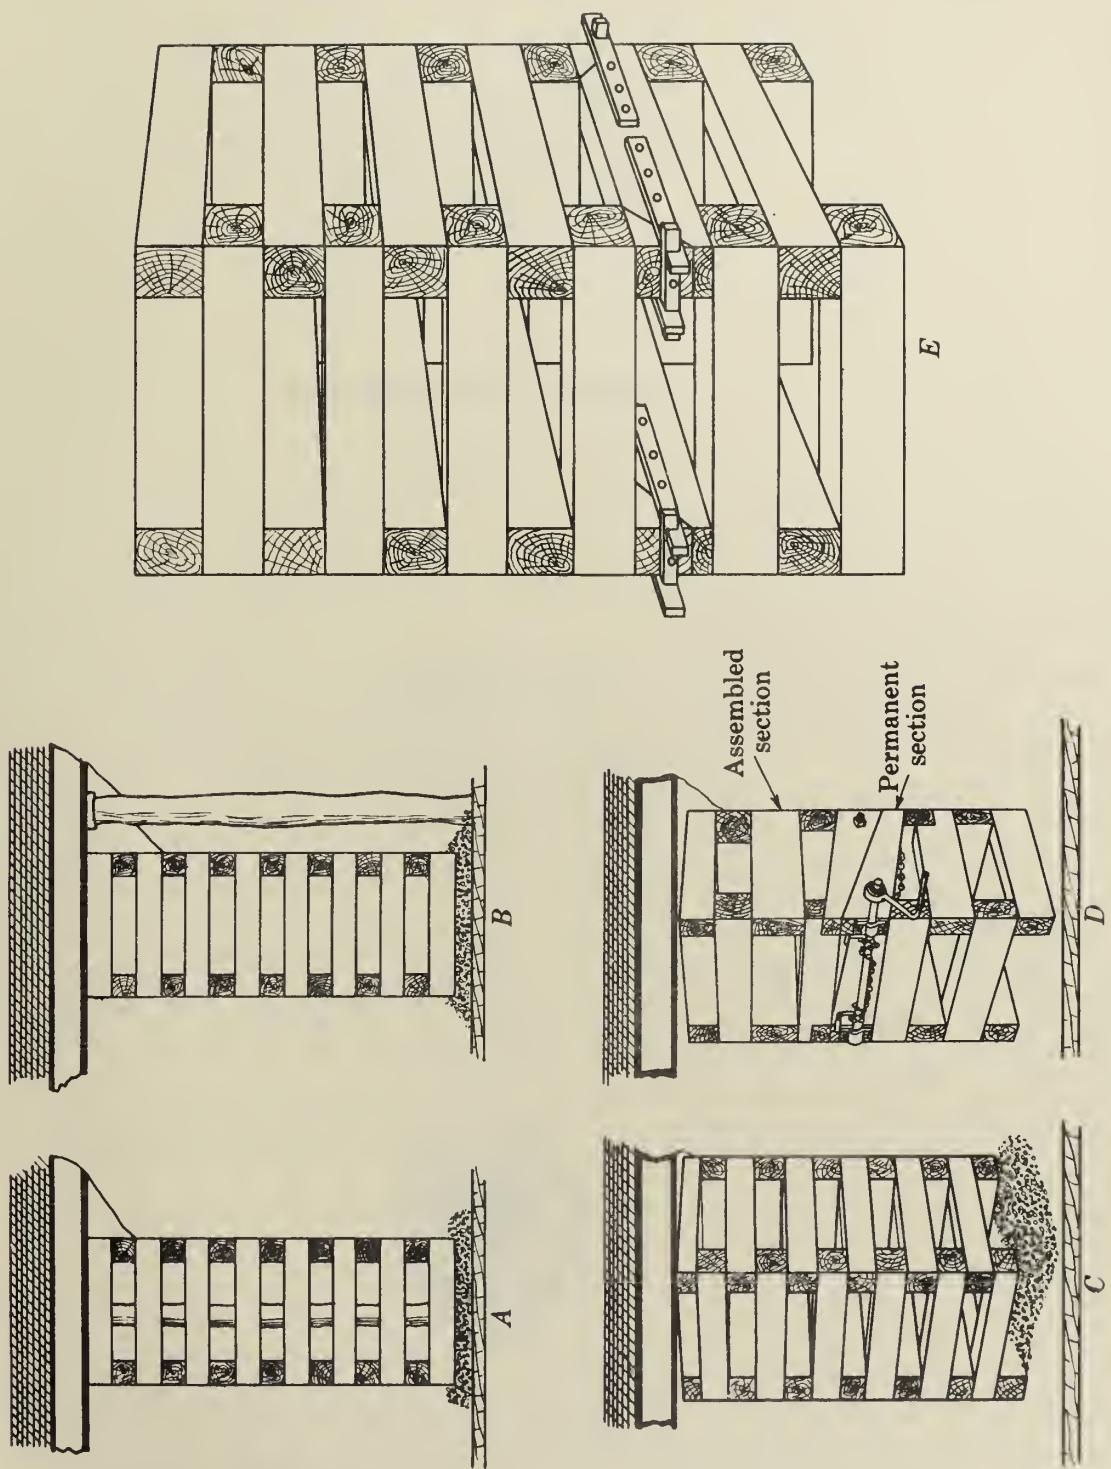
Types of cribs used in open-end work and in shortwall mining. *A*, Crib with center post; *B*, crib with post adjacent; *C*, crib resting on loose coal; *D*, built-up crib with wedge contact posts for adjustment; *E*, proposed temporary crib.
